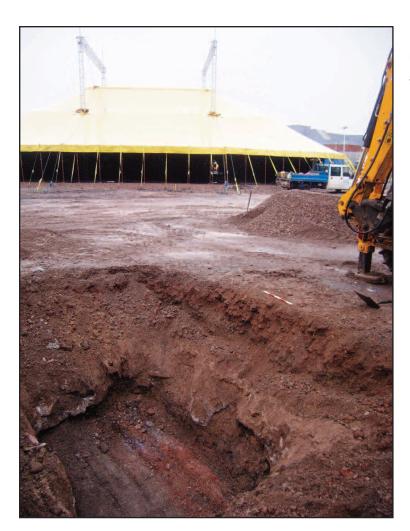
New drainage trench, showing modern made ground overlying 19th century made ground, viewed from the west
